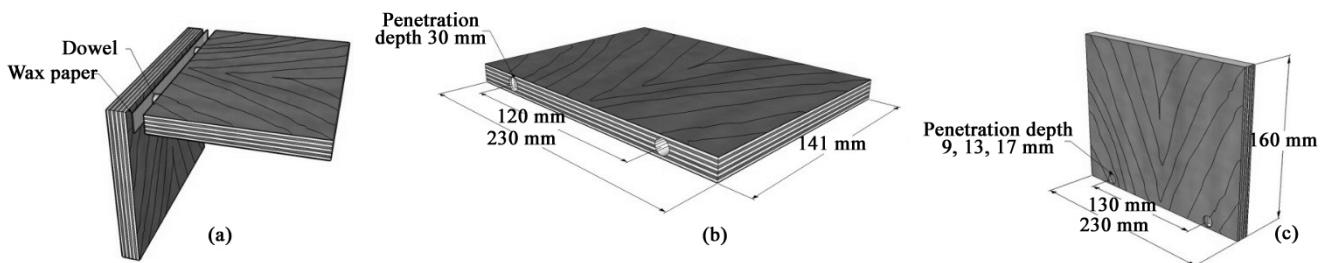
Configuration and dimensions of joints, a: assembled joint; b: edge member; c: face member.
